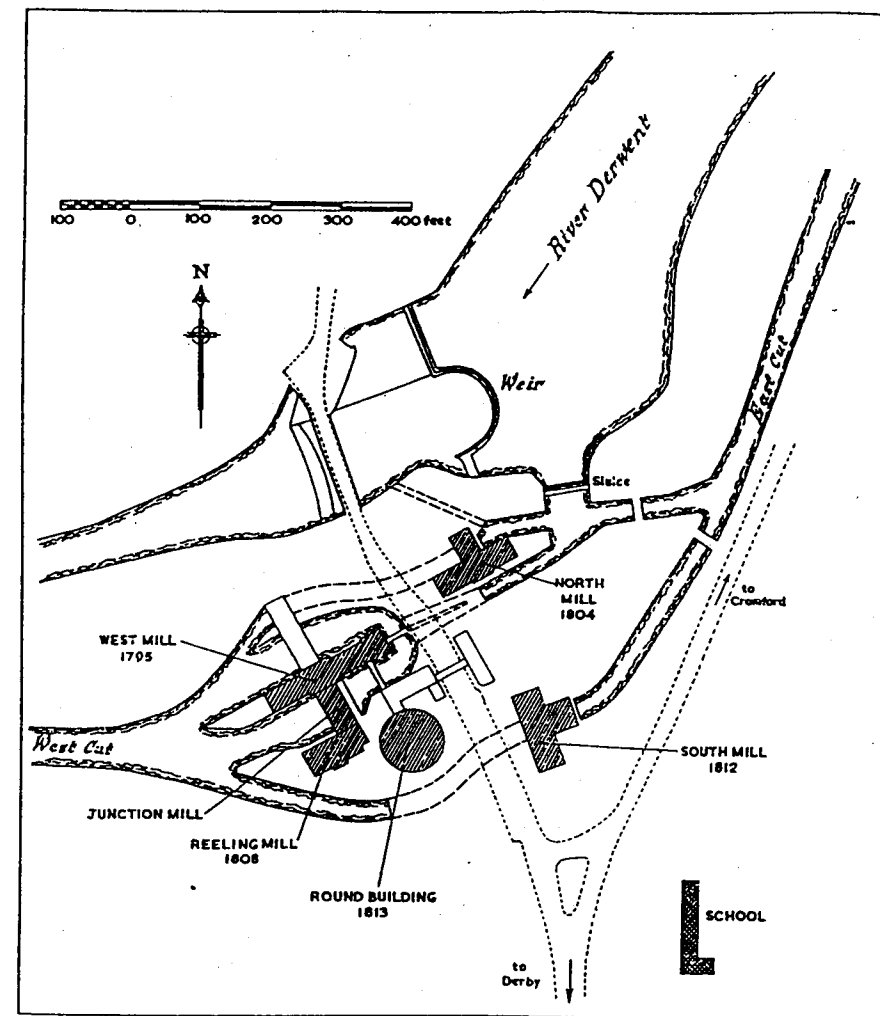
Plan of Strutt's Cotton Mills at Belper.
